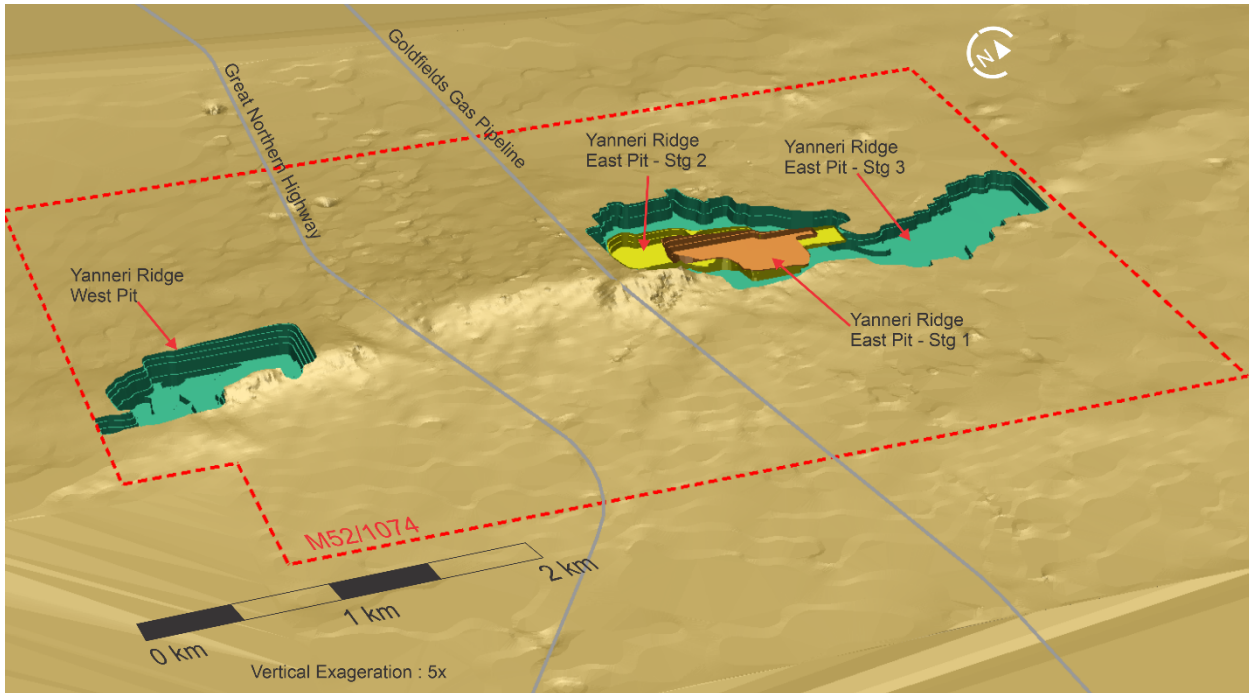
Butcherbird Pit Design and Staging, Looking North East
